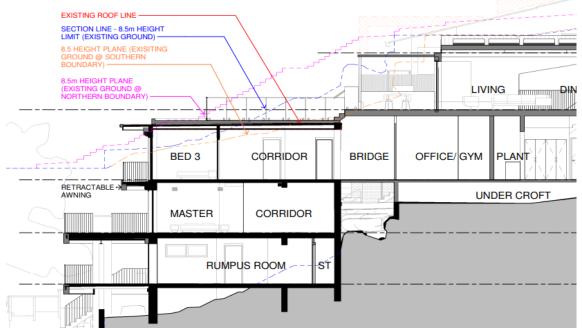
Plan extract showing 8.5 metre building height breaching elements
